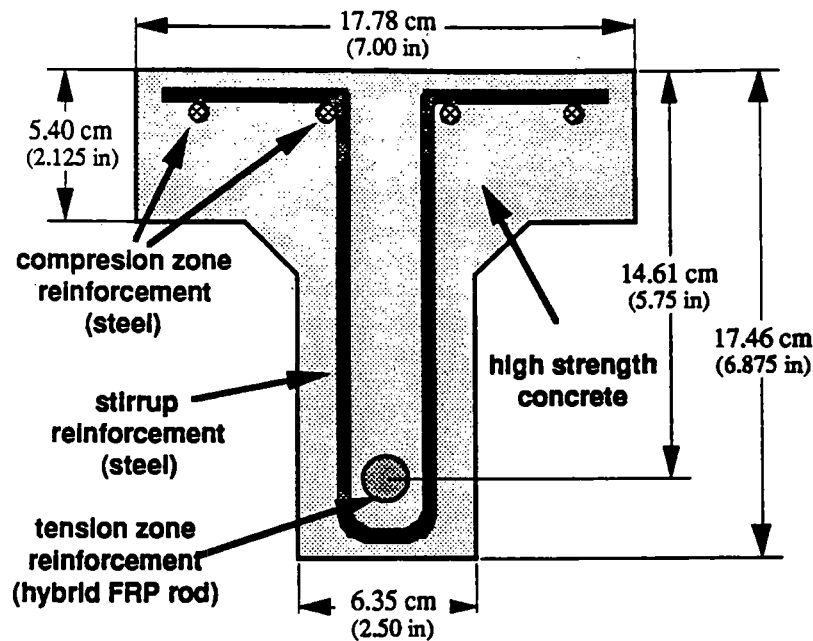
Hybrid FRP Test Beam Cross-Section
